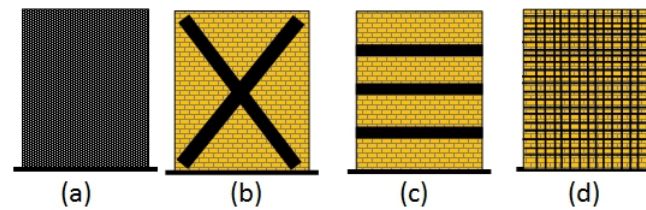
URM in plane FRP retrofitting schemes (a). Composite sheets bonded to entire wall surface. (b) Cross arrangements of FRP plates or laminates. (c) Horizontal strips of FRP laminates. (d) grid disposition of FRP.
